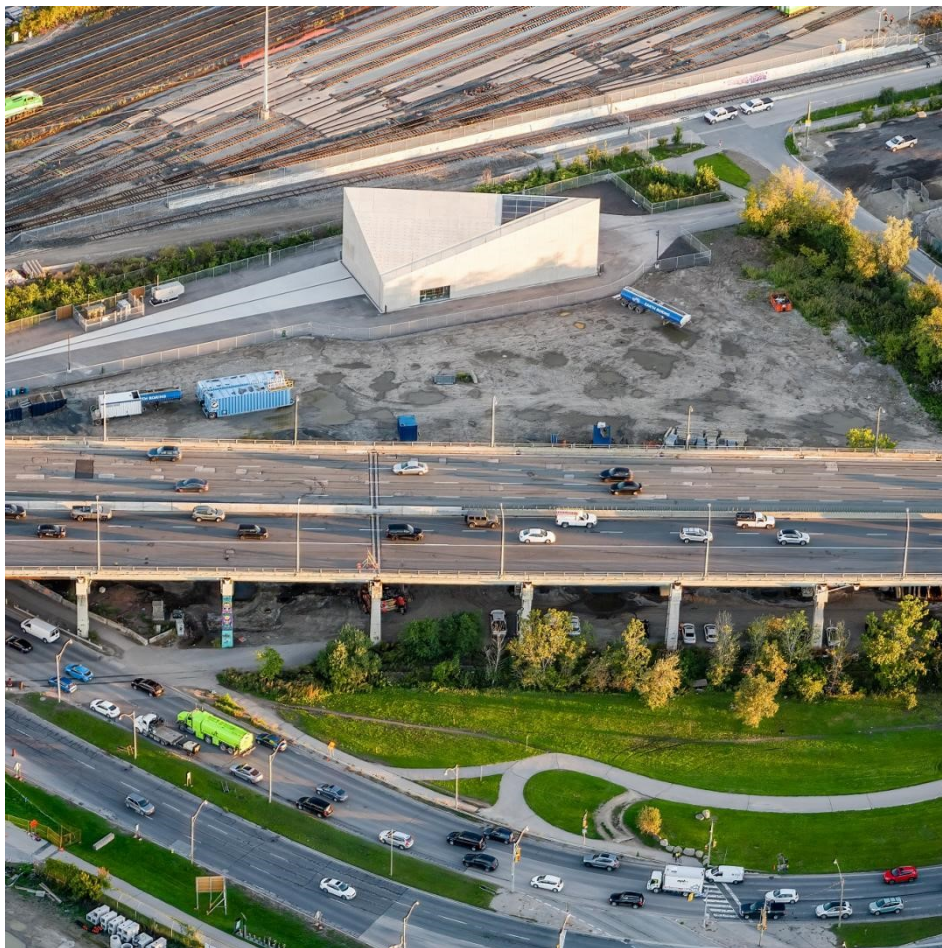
Aerial view of the brand-new stormwater management facility, located on Cherry Street in Toronto's Port Lands (Waterfront Toronto. Stormwater Treatment System. Accessed June 14 2024).
